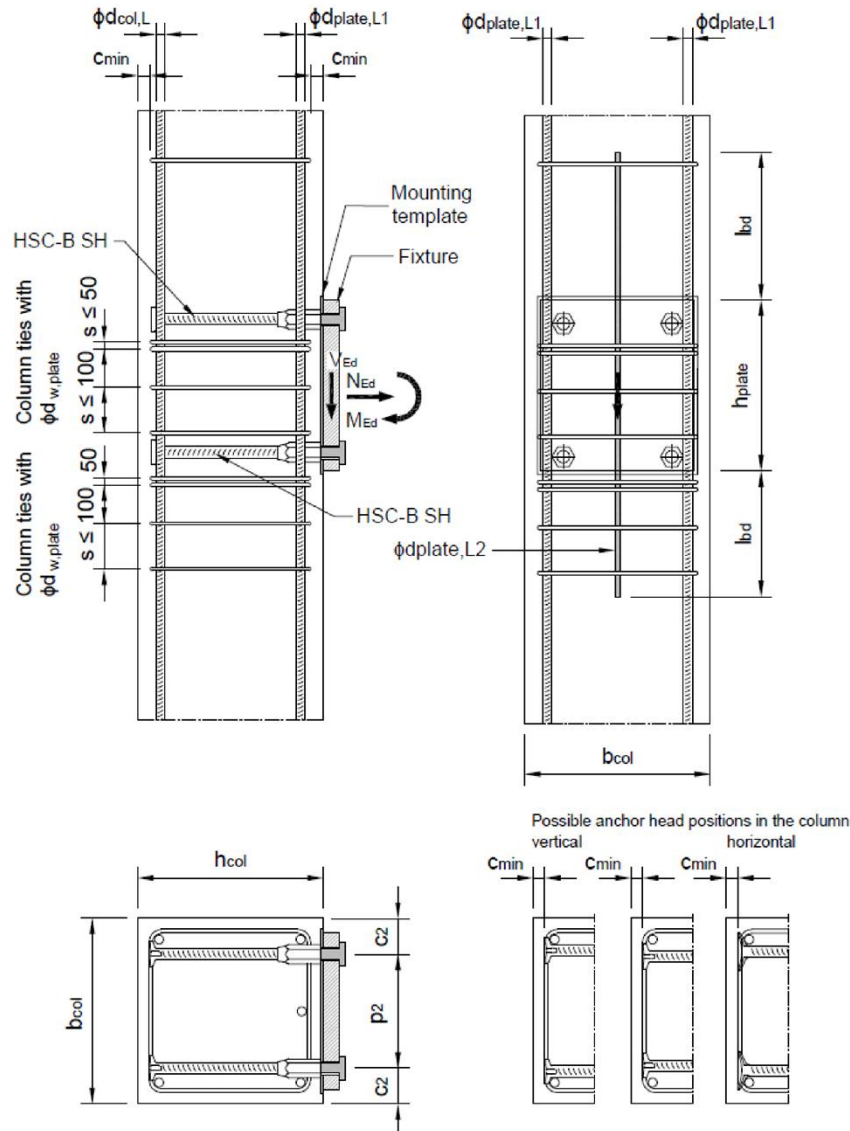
Dimensioning and detailing of bolted end-plate connections
